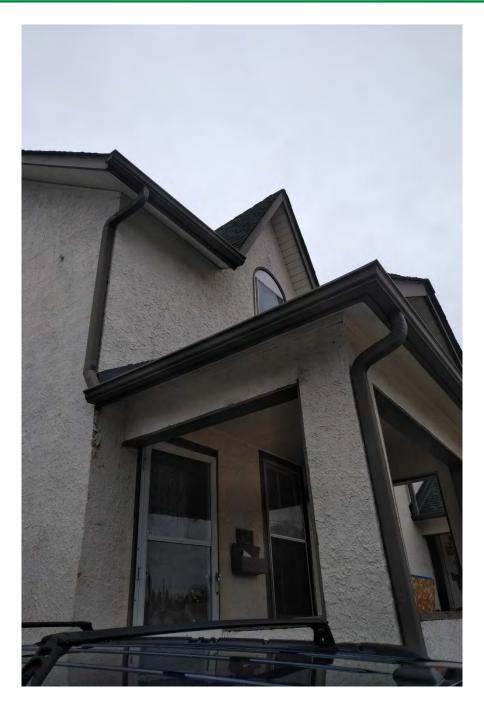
Southeast elevation of the residential dwelling, showing front porch (174 Victoria St)
